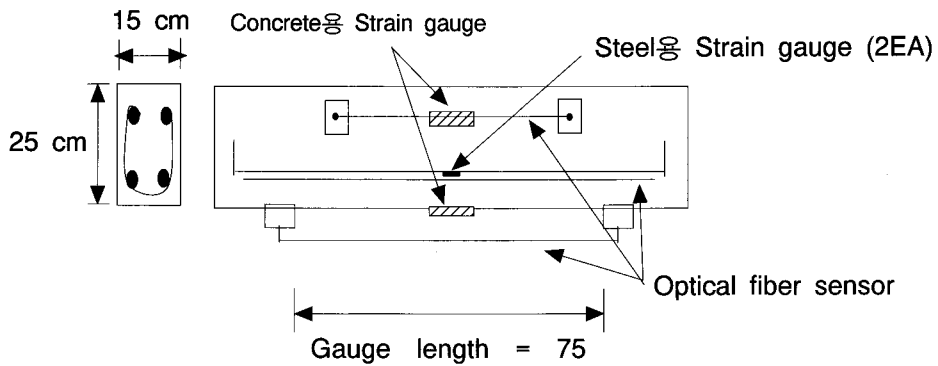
Specimen for compressive test with embedded steel (CTL II)
